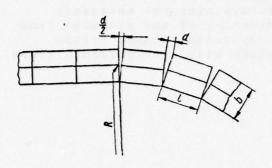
Scheme for laying rectangular slabs on a curve in a prefabricated pavement with junctions of changing width.
